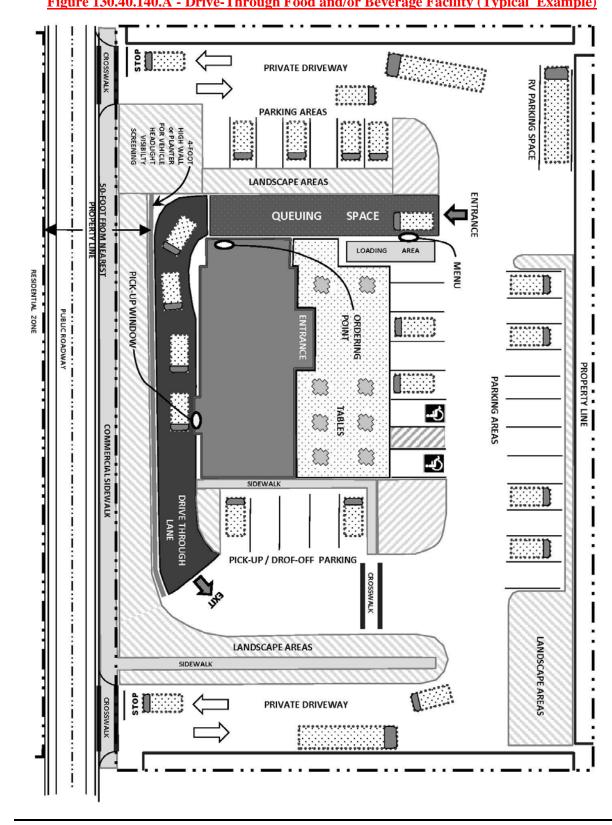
A - Drive-Through Food and/or Beverage Facility (Typical Example)
